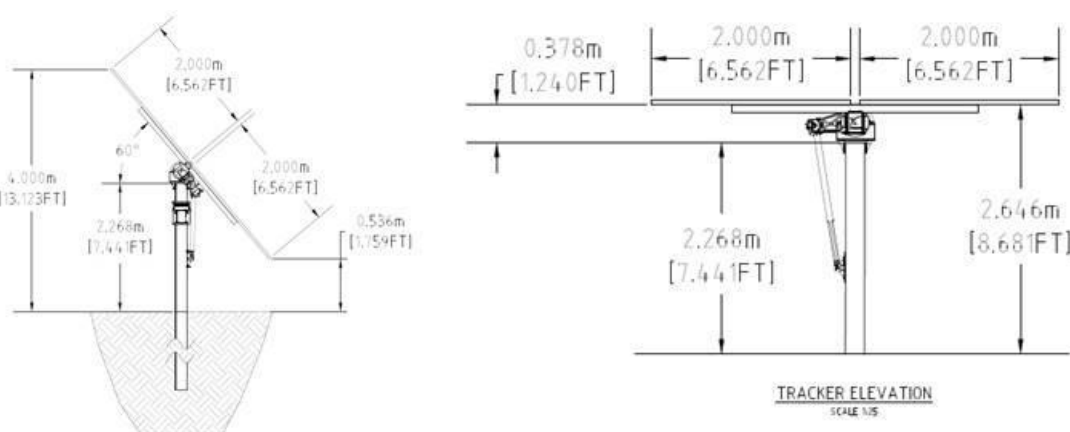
Tracking System Elevation. Not to scale. Source: NG Electrical Plans (Dated 5.06.2020)
